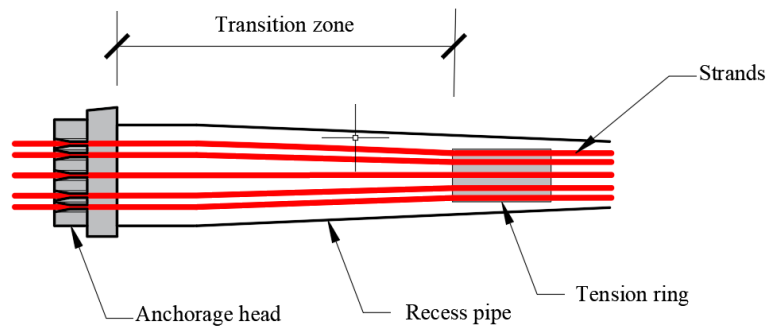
Cross section of a 19-strand stay cable at the cable anchorage.
